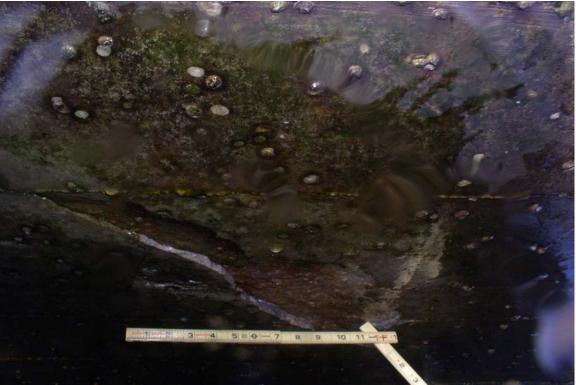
INCIPIENT SPALL IN UNDERSIDE OF BENT 145 PILE CAP IN NORTHEAST CORNER
